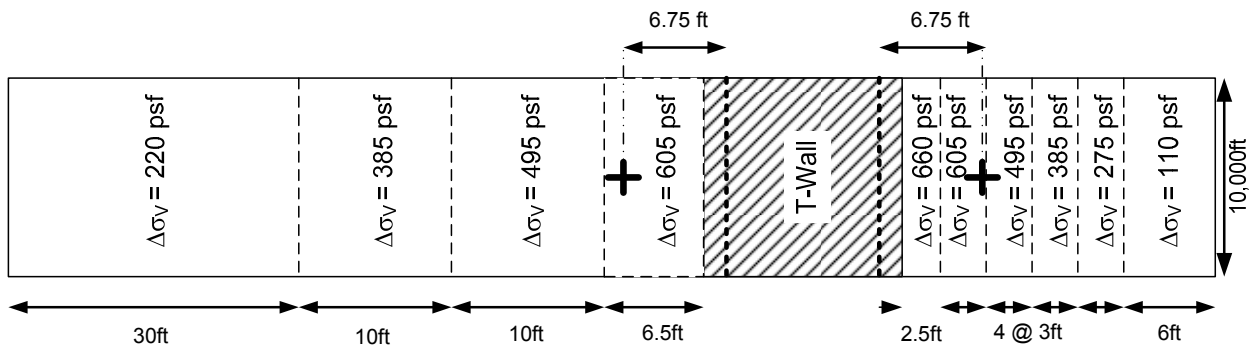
Plan view showing subdivision of fill into uniform area loads, excluding the fill overlying the T-Wall base. The locations where compression will be determined on the flood side and protected side are indicated with cross-hairs
